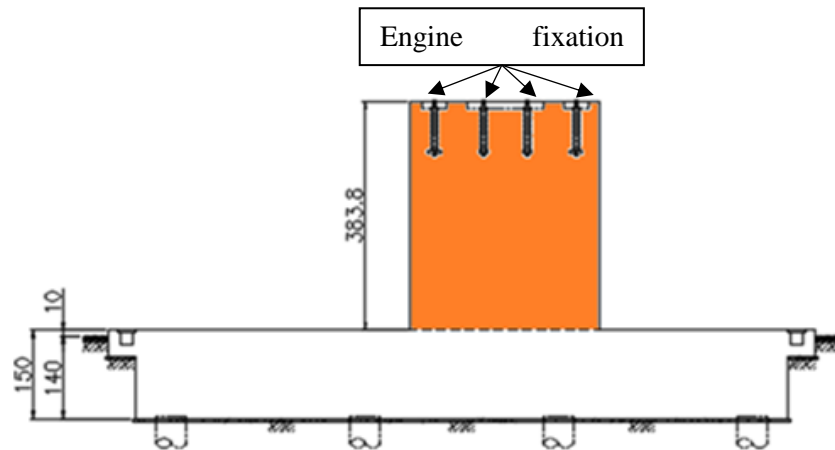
B-B View from de concrete foundation (dimensions in centimeters).
